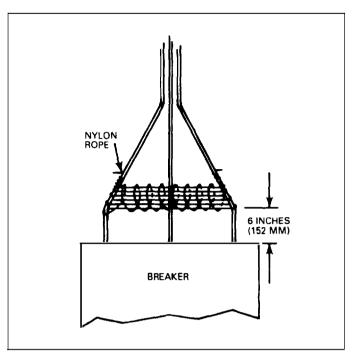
Securement of Cable (See Caution Note for Bracing Instructions)
